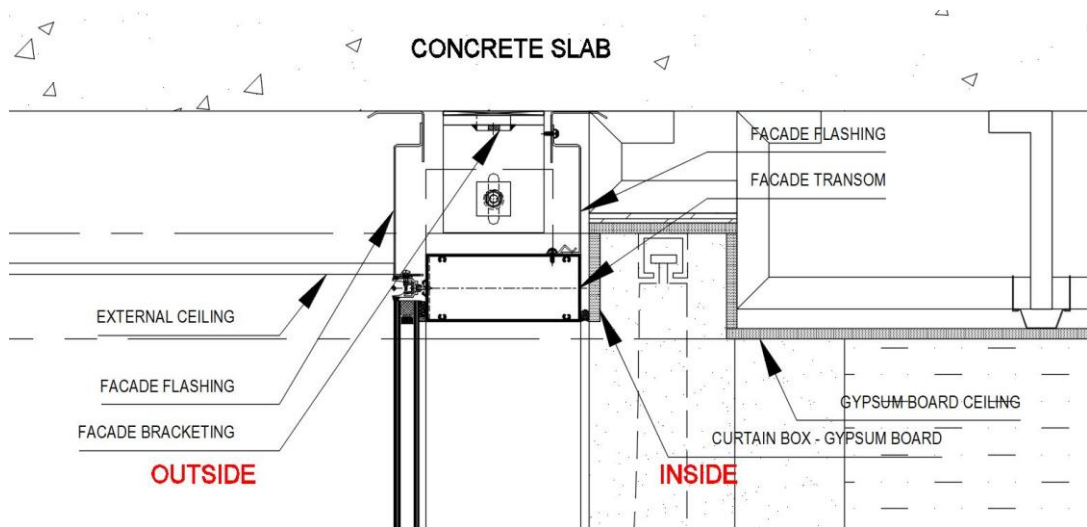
Detail illustrating interior ceiling and facade interface (Author)
